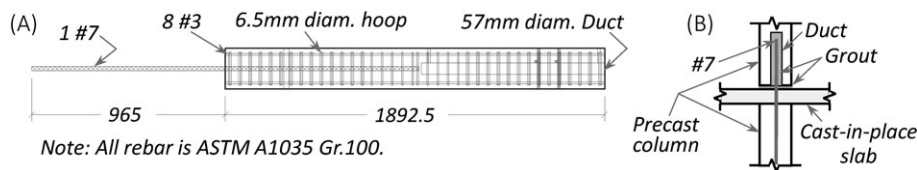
Precast column: A, reinforcing detail; B, column joint detail (units: mm)
